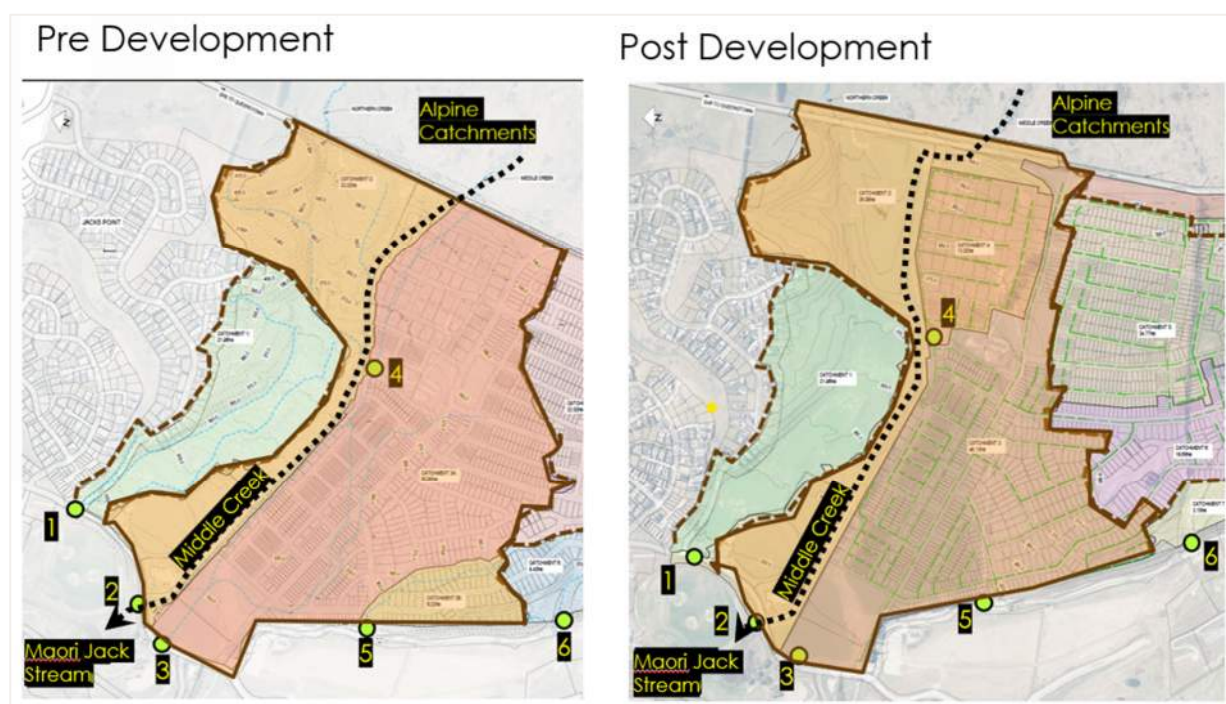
Northern Outlets to Middle Creek and Māori Jack Stream. Post development catchment runoff will pass through Outlet 2 (an existing 4mx1m box culvert under Homestead Bay Rd) draining to Māori Jack Stream. Flows will be attenuated through two Basins incorporated into the subdivision. Outlets 3 and 5 will pass minimal post development flows due to catchment diversions.
